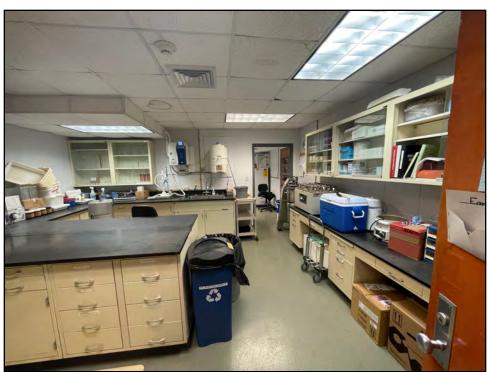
Interior view of B144 (Office) in B001 showing wall to be demolished between office space and laboratory, camera facing south.
